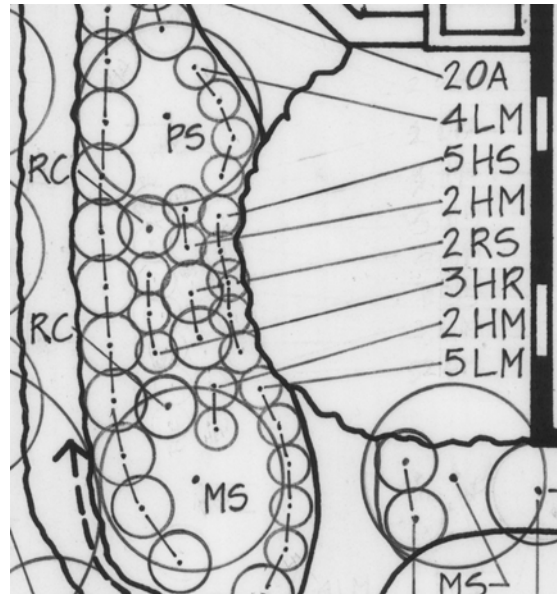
and 3.15 Sideyard Garden rendering and planting plan for the original design
